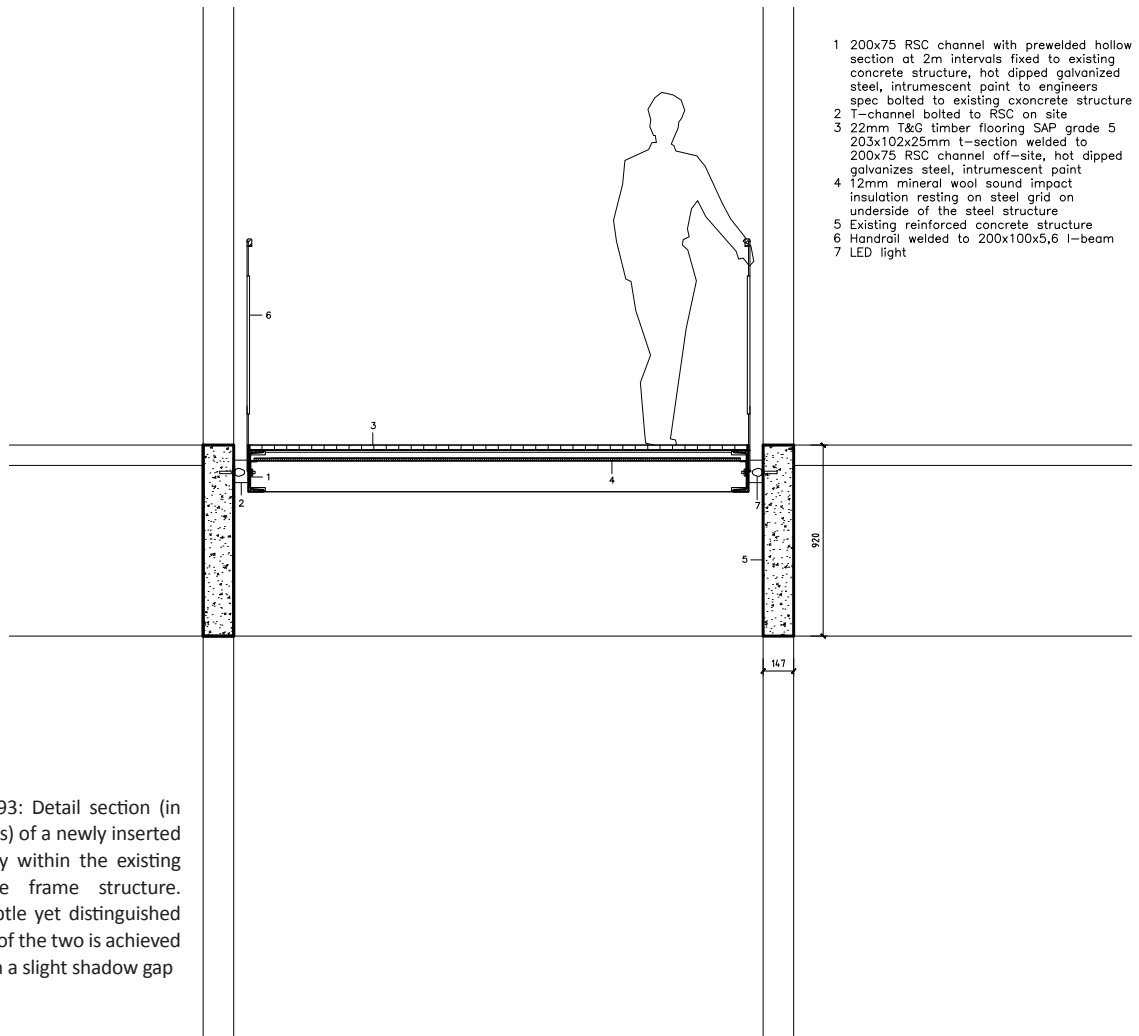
Detail section (in progress) of a newly inserted walkway within the existing concrete frame structure. The subtle yet distinguished joining of the two is achieved through a slight shadow gap
